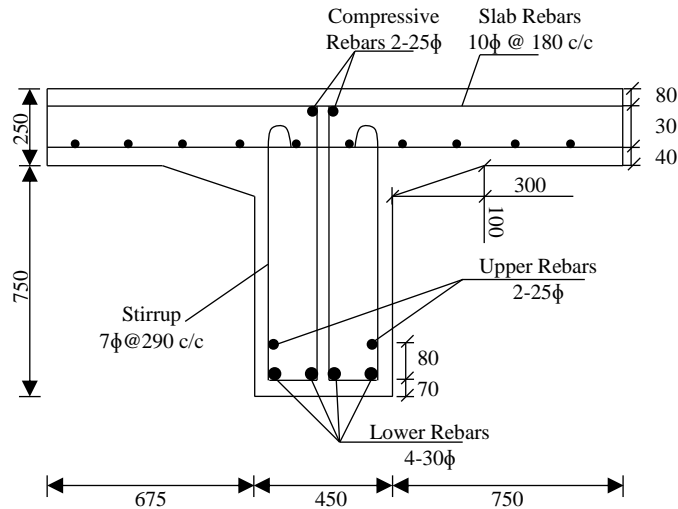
Reinforcement details of T-beam girder (all dim. in mm)
